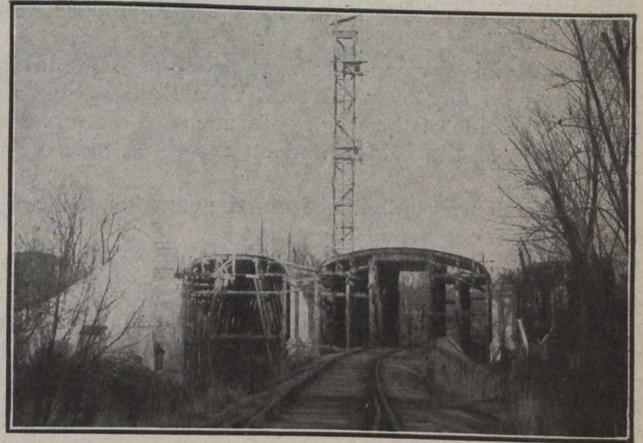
Falsework and Centering for Arched Superstructure
